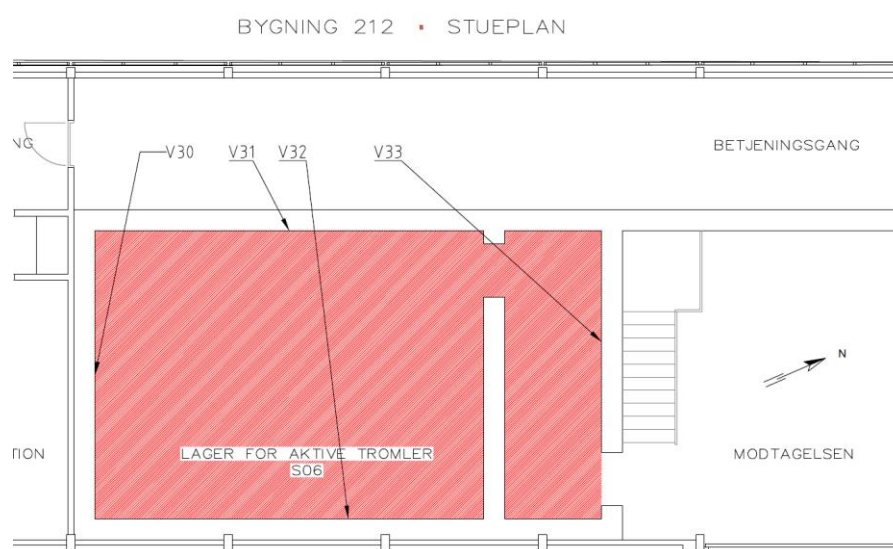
Section of building 212 containing the Drum Storage (red shaded area)
